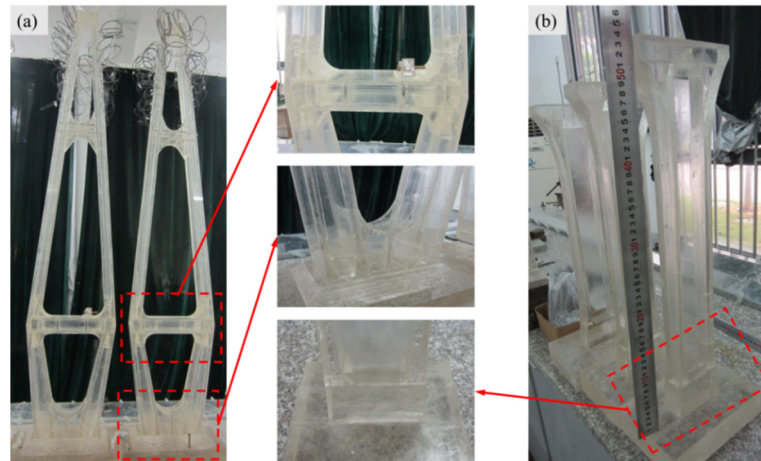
Detailed design of testing specimen (a) towers and (b) piers.
